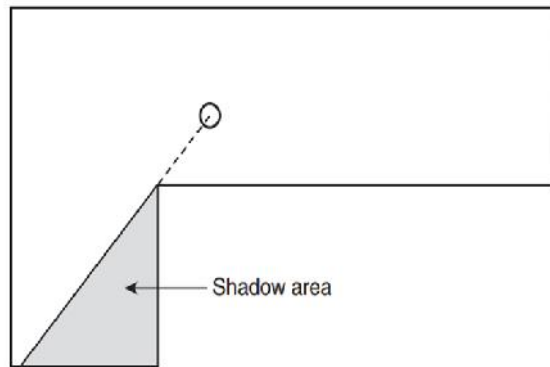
Shadow Area Created by a Wall.
